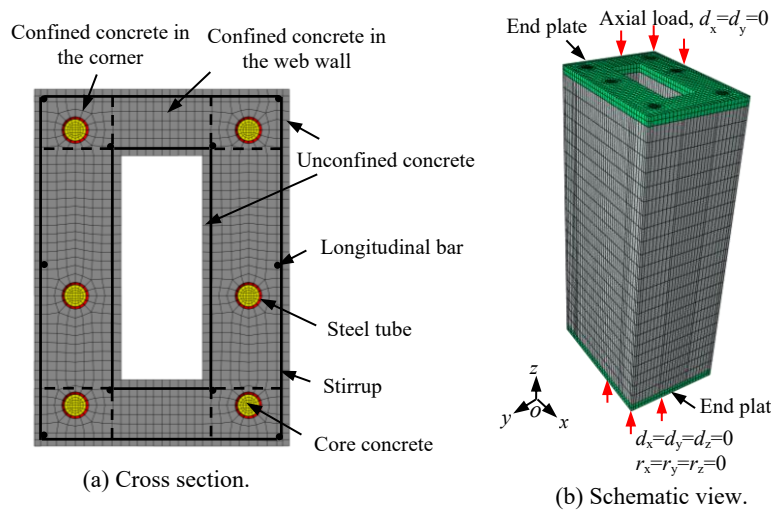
Finite element model of concrete-encased CFST box stub column.
